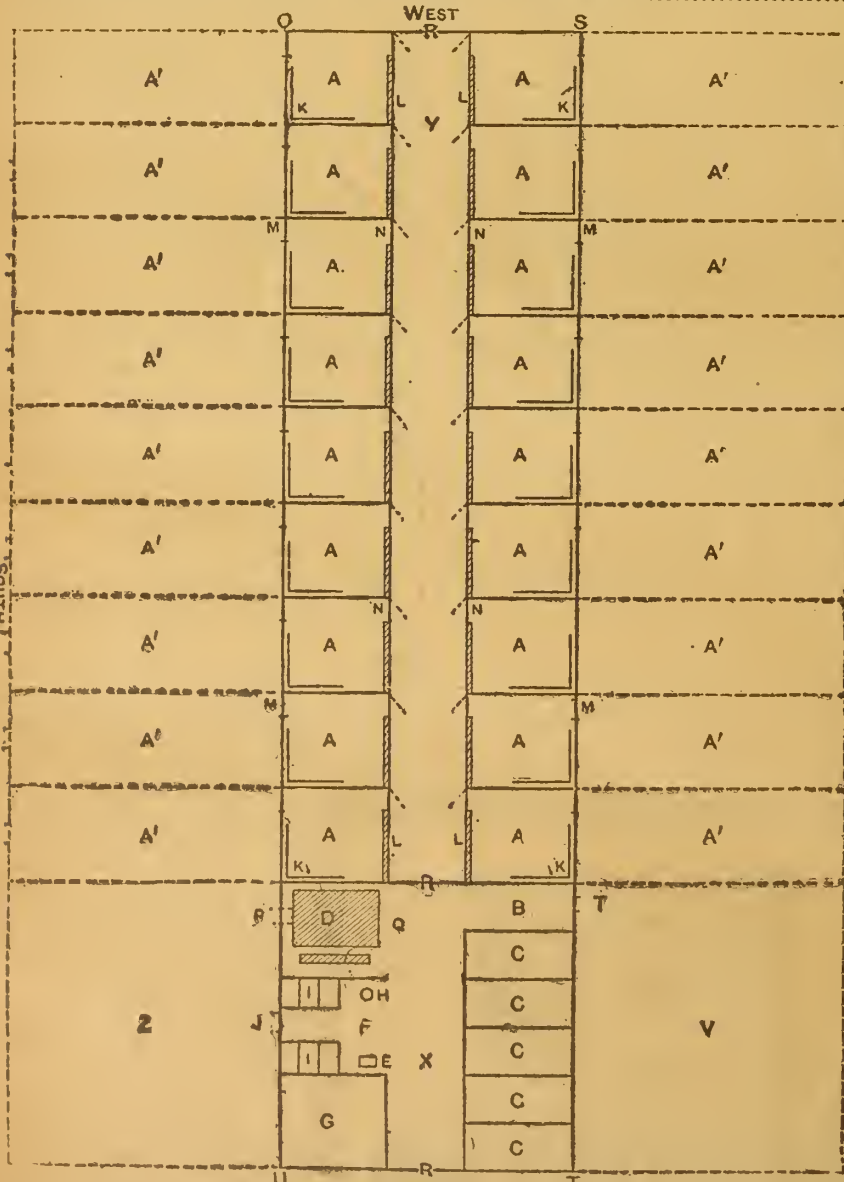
PLAN OF CENTRAL HOG HOUSE.
